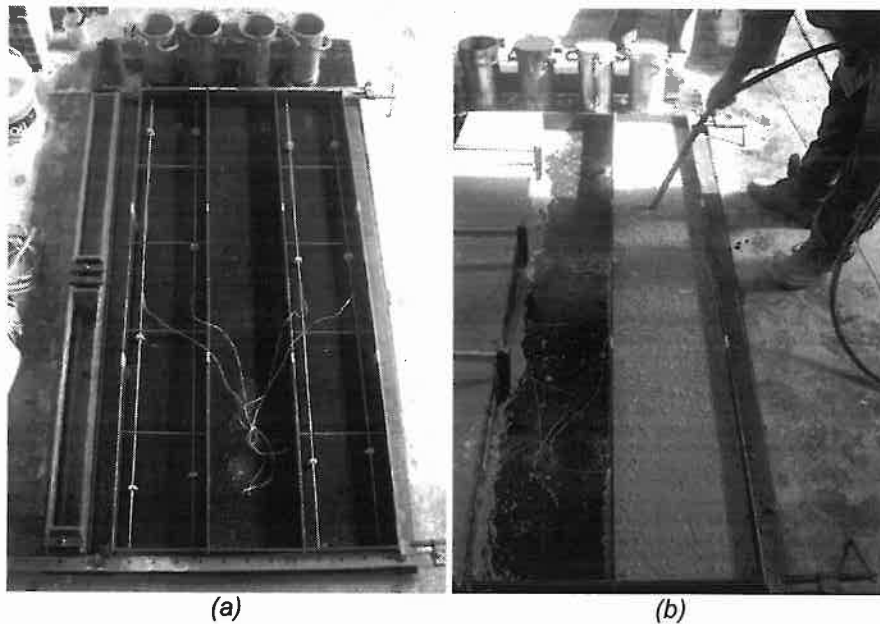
Slab strips, cylinders and beam specimens: (a) formwork set up and moulds used, and (b) plain concrete consolidation.
